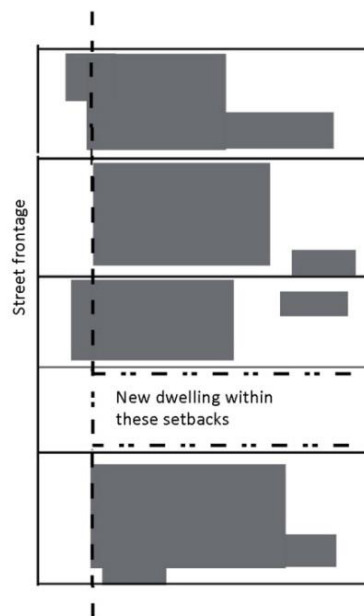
Setbacks for New Buildings (indicative sketch only, not to scale)
